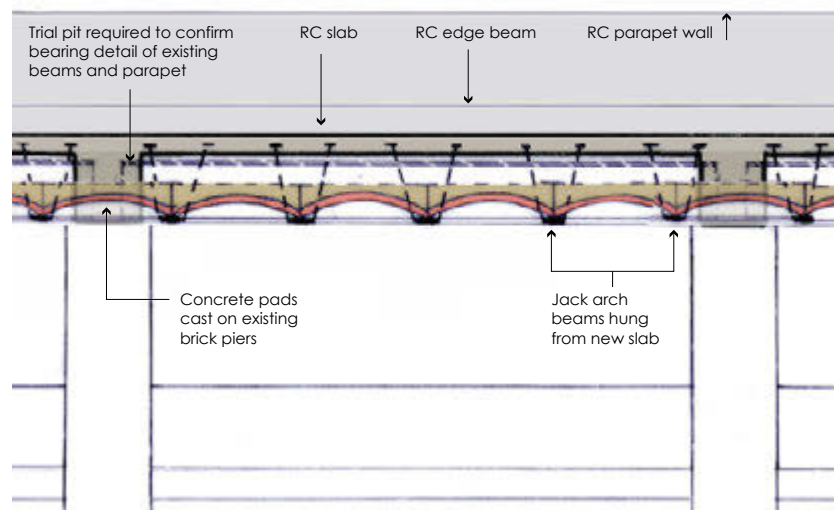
Longitudinal section through proposed jack arch over decking
